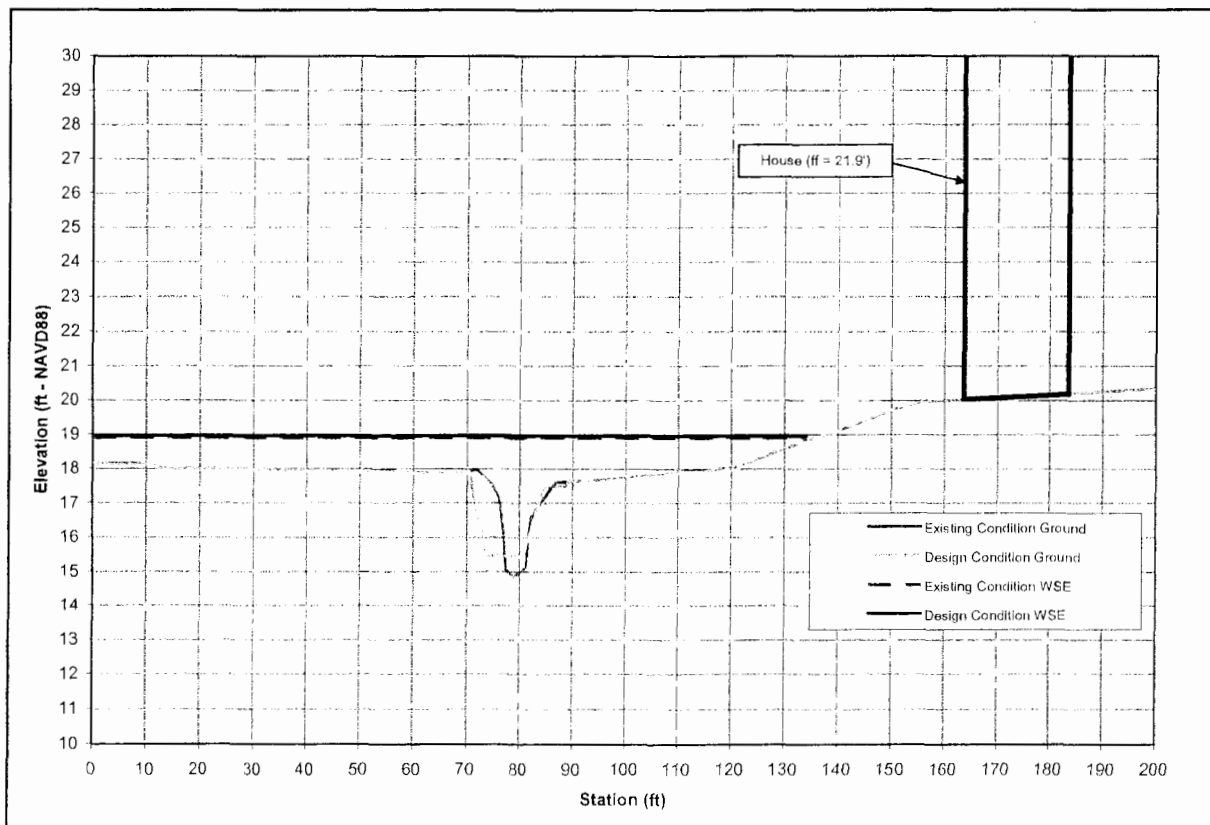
Cross-section 5783 showing existing and design condition water surface elevations (WSE) at 100-yr flood ( $Q_{100} = 445\text{cfs}$ ).
